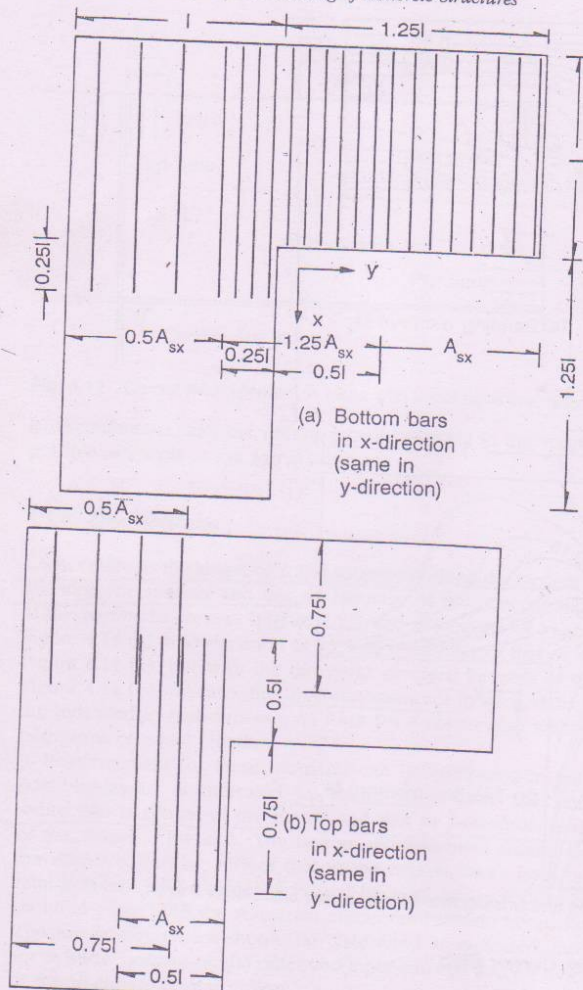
Reinforcement in corner slab (Distribution and corner bars not shown)
